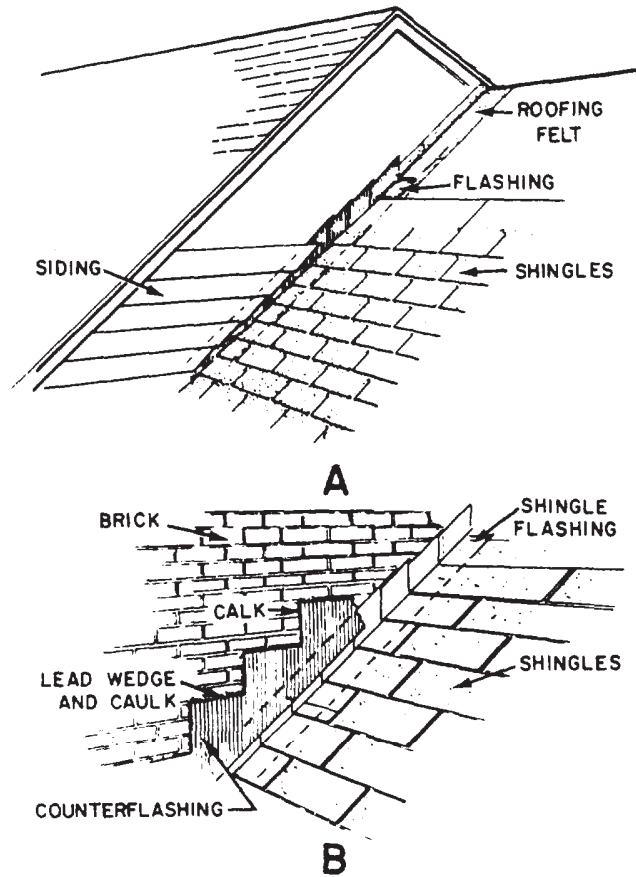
Flashing at roof and wall intersection: A. Wood siding wall; B. Brick wall.
